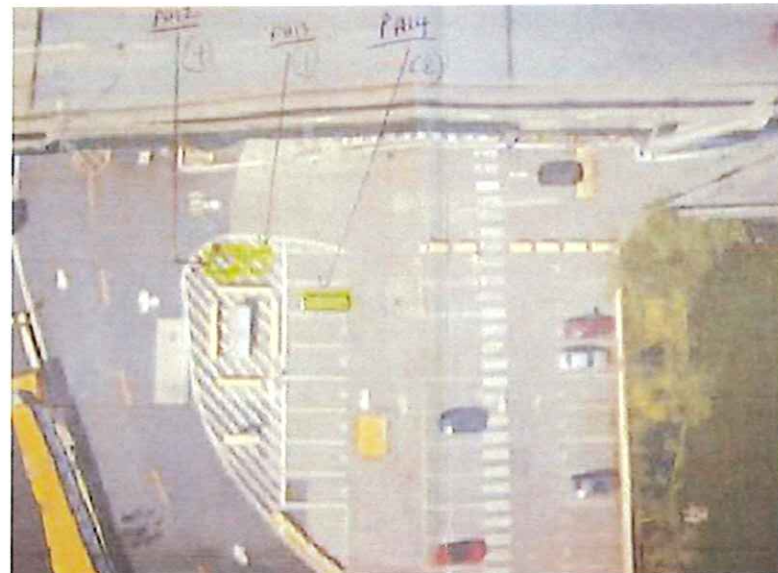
PLAN VIEW SKETCH SHOWING LAYOUT LOCATIONS FOR POTHOLE 12-14 (NORTH POTHOLE)
